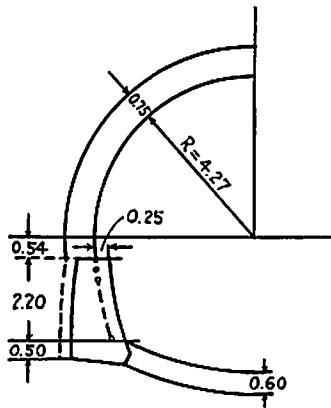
Smooth blasting at the side-wall (concrete) fo the Kamui pilot tunnel
